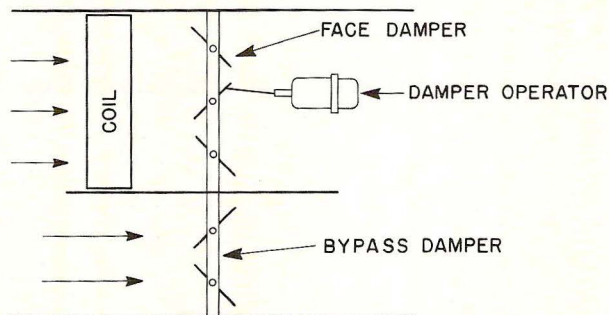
Face and Bypass Damper Proportioning Type With Opposed Blades
